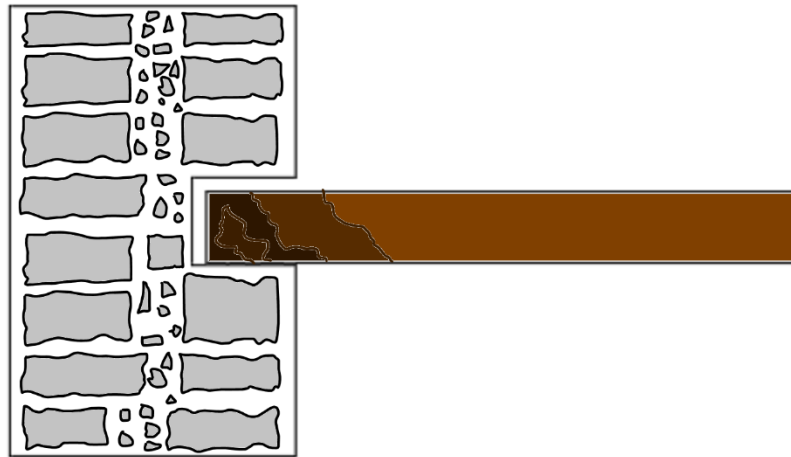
Deteriorated and damaged timber floors.
